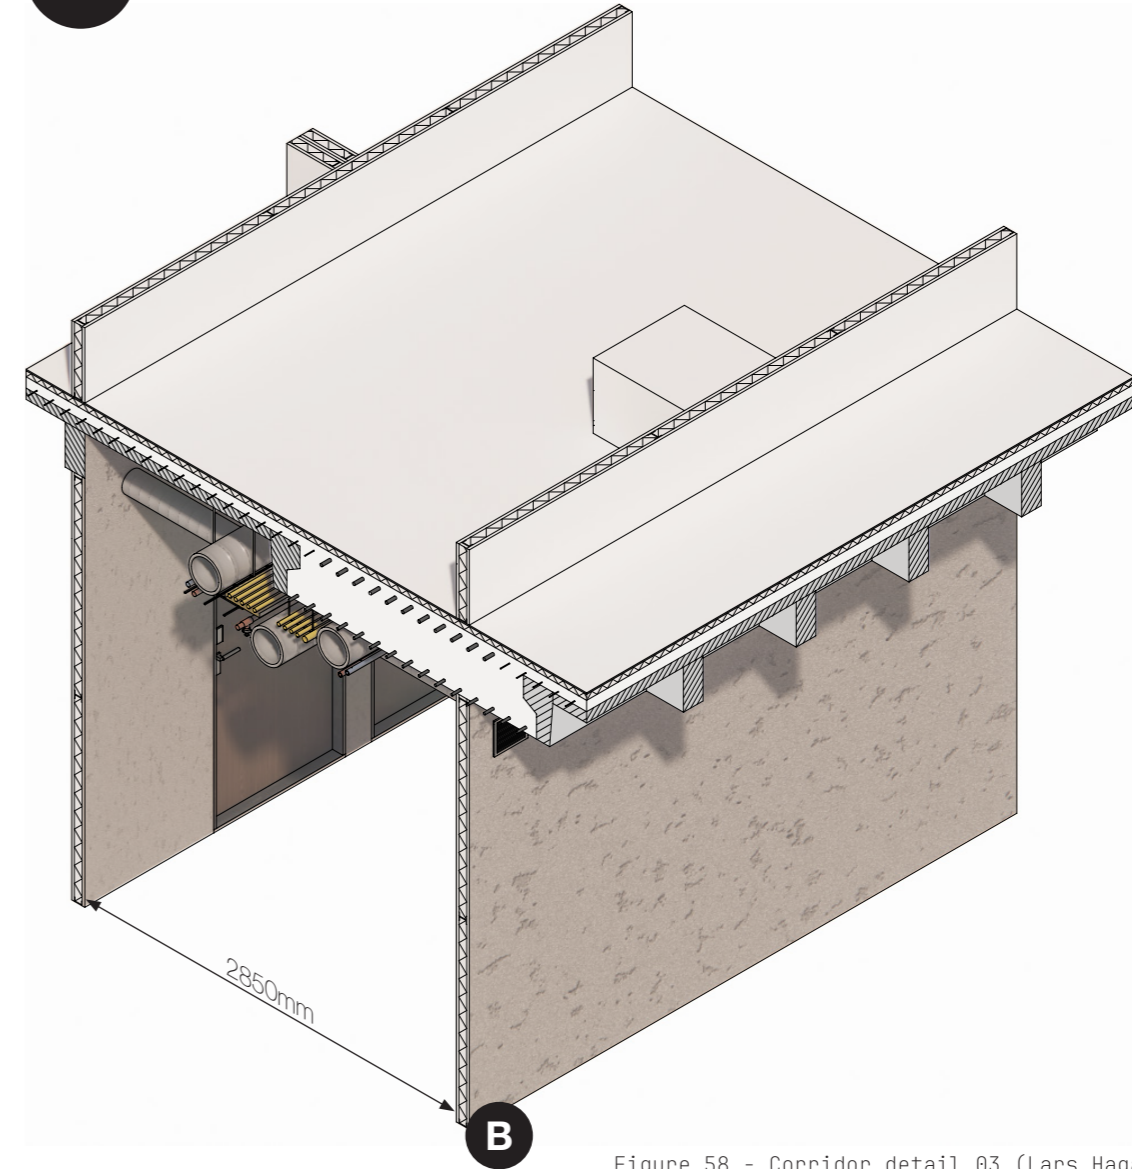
Corridor detail 03 (Lars Haga, 2026)
